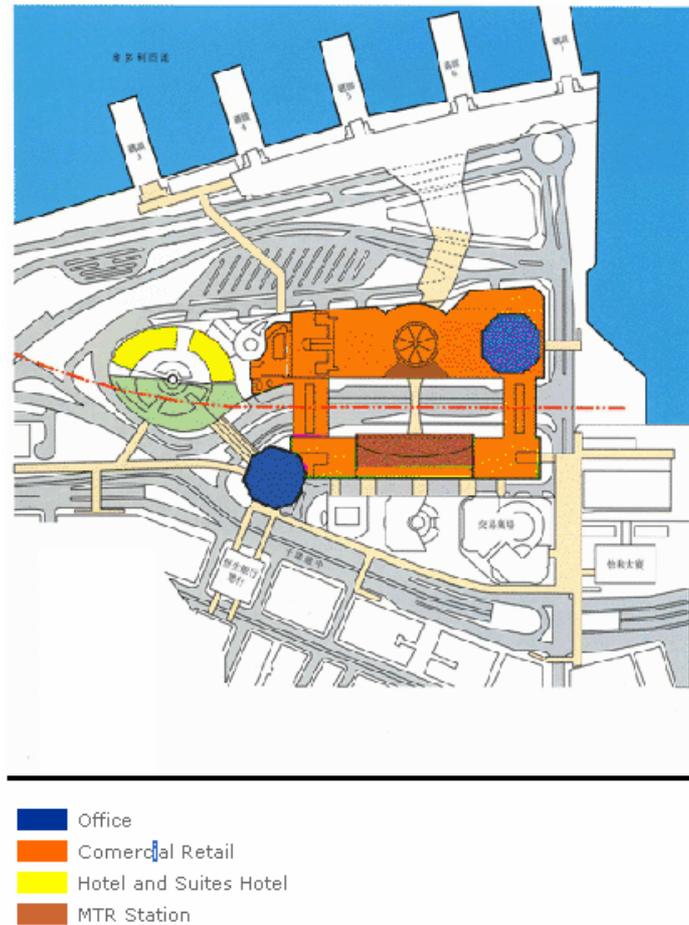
Hong Kong Station Master Plan - (MTRC 2005)
